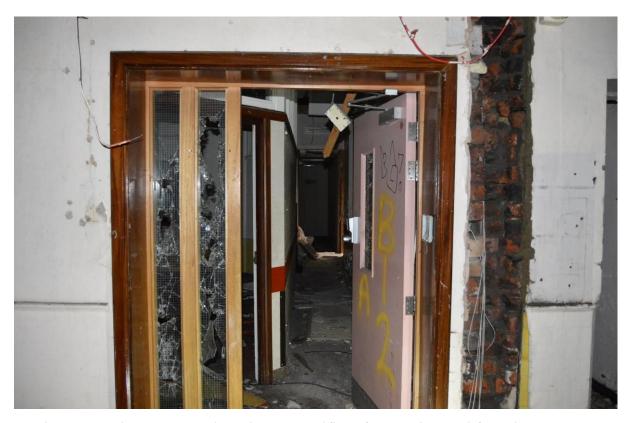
Modern entrance and corridors to ground floor of east pavilion ward, formerly out-patients dispensary and consulting rooms (facing south east).
